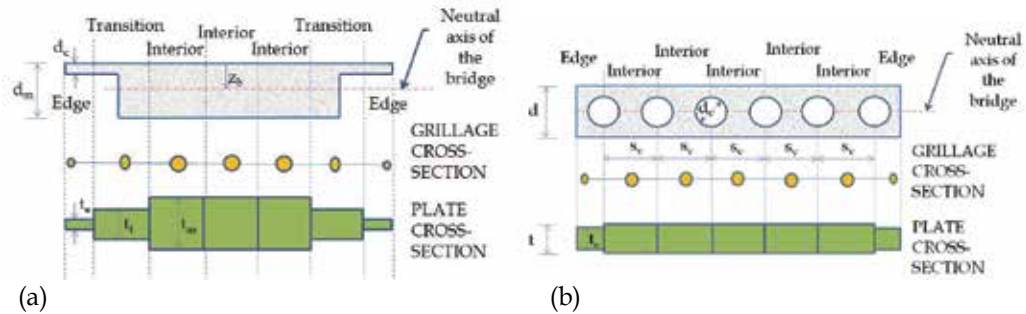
Grillage and plate FEM: (a) Slab with edge cantilever; (b) Voided slab
